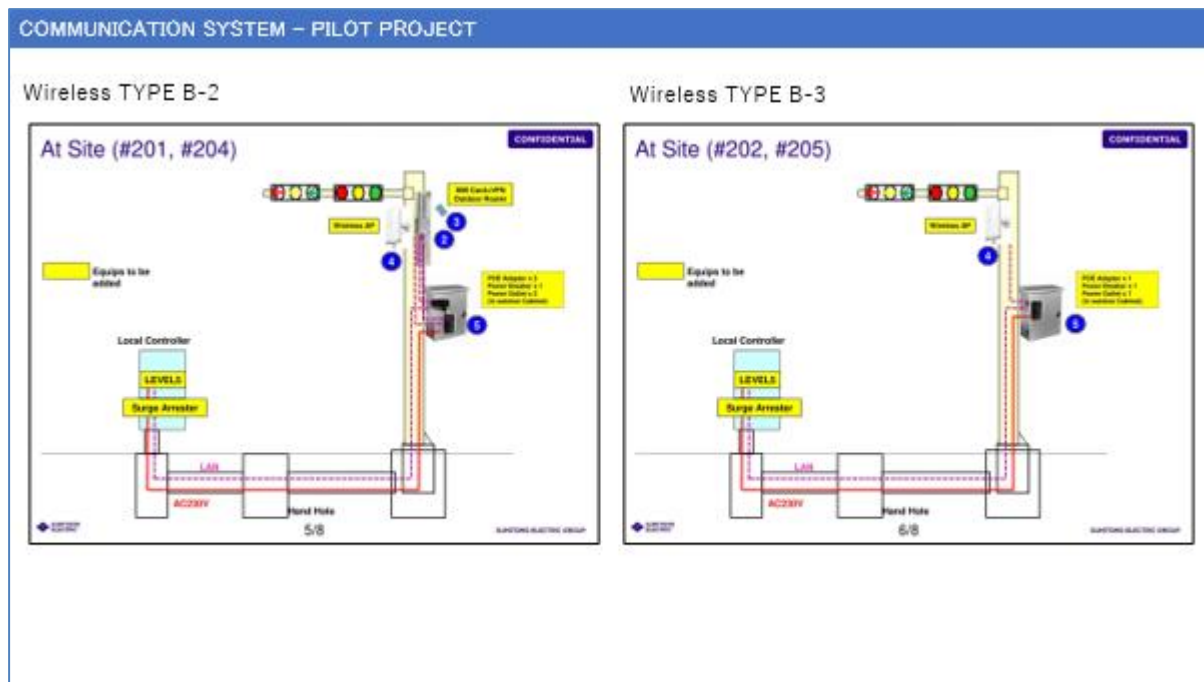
The elevation of Type B-2 and B-3 of Pilot project
